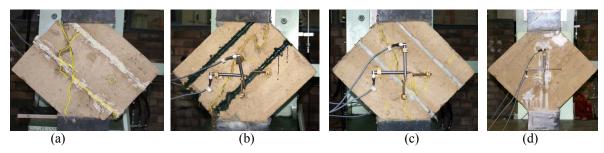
Failure modes of the retrofitted rammed earth specimen. (a) Polyurethane foam adhesive (b) epoxy resin adhesive (c) hydraulic repair mortar adhesive (d) grouting
